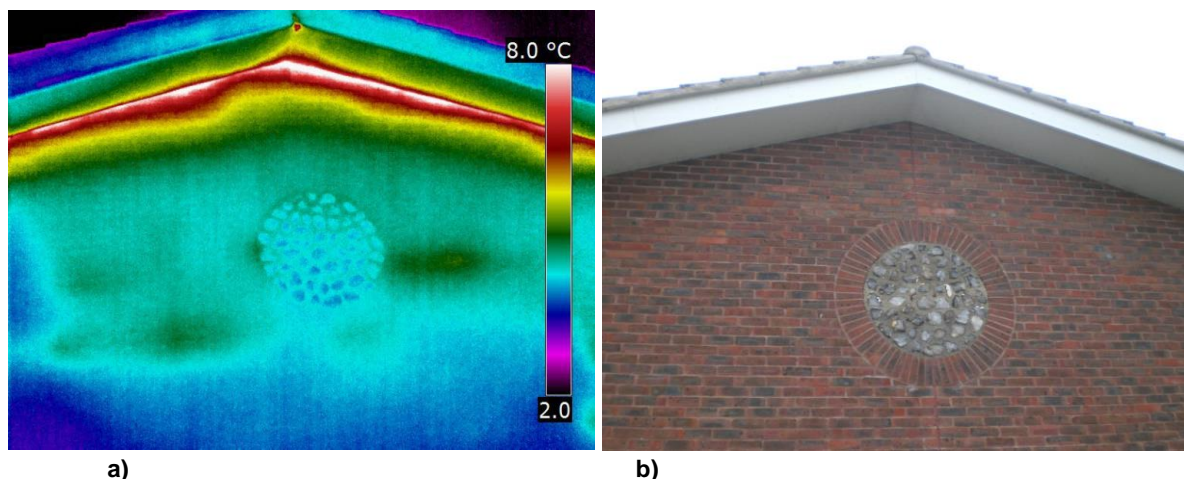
(a) West pitch roof soffit thermogram. Note: Thermal abnormality is likely to be due to air leakage from the building. (b) West pitch roof soffit digital photograph.
